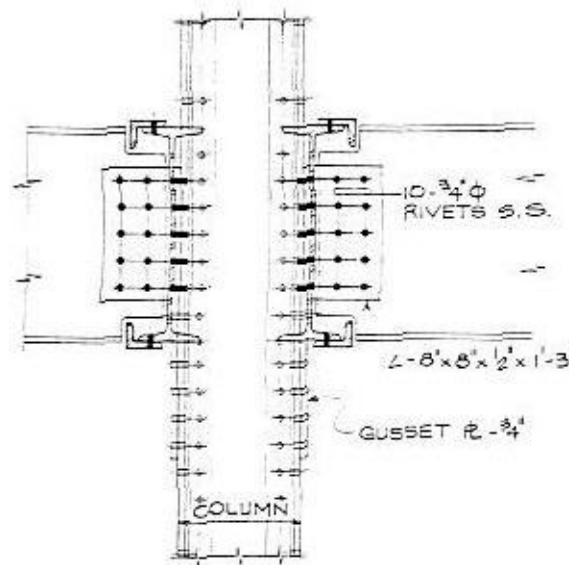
Riveted Beam-Column Connection, Pre-1920s
